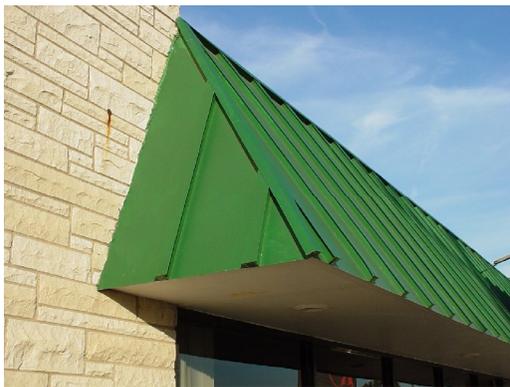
Avoid using materials that do not compliment the building and surrounding buildings. Awnings should be in scale with the other façade elements and with neighboring buildings.
